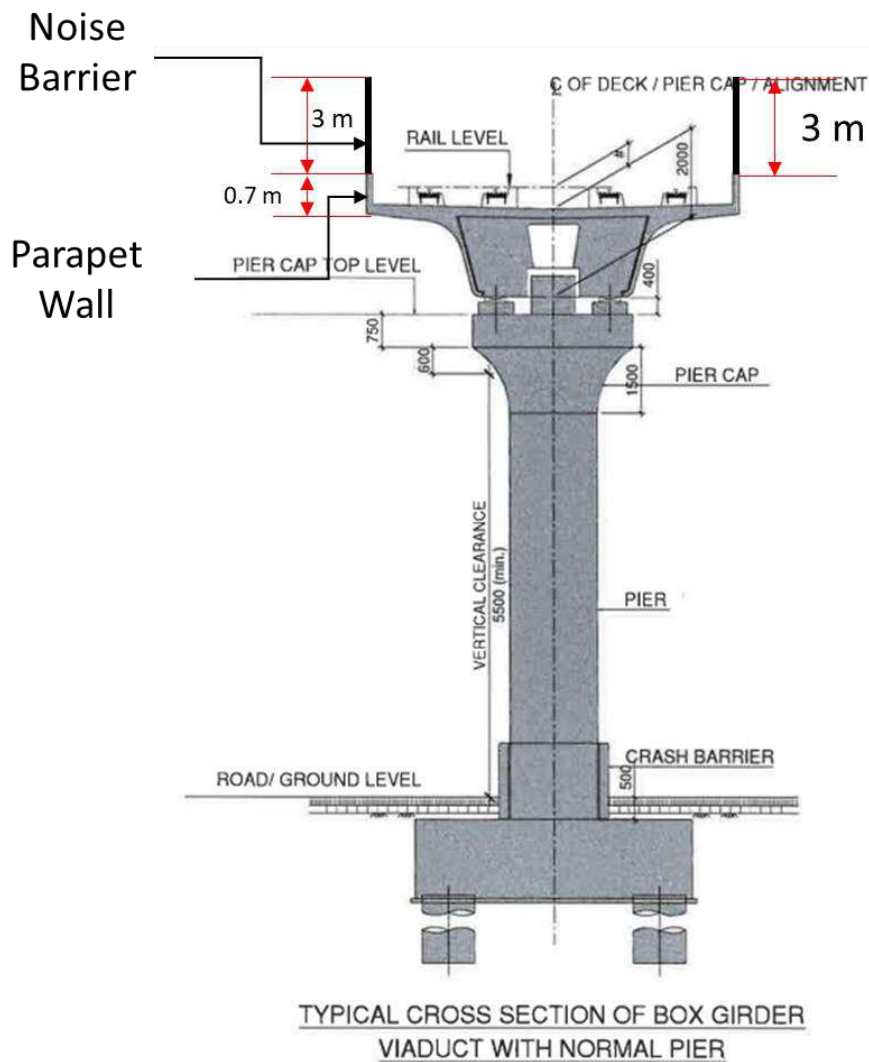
Cross section of the Box girder showing location of Noise Barrier
